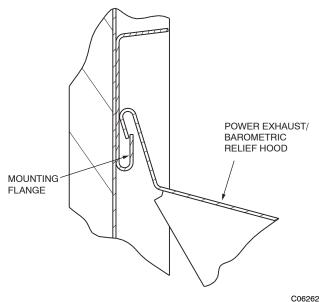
Barometric Relief/Power Exhaust Hood Flange
